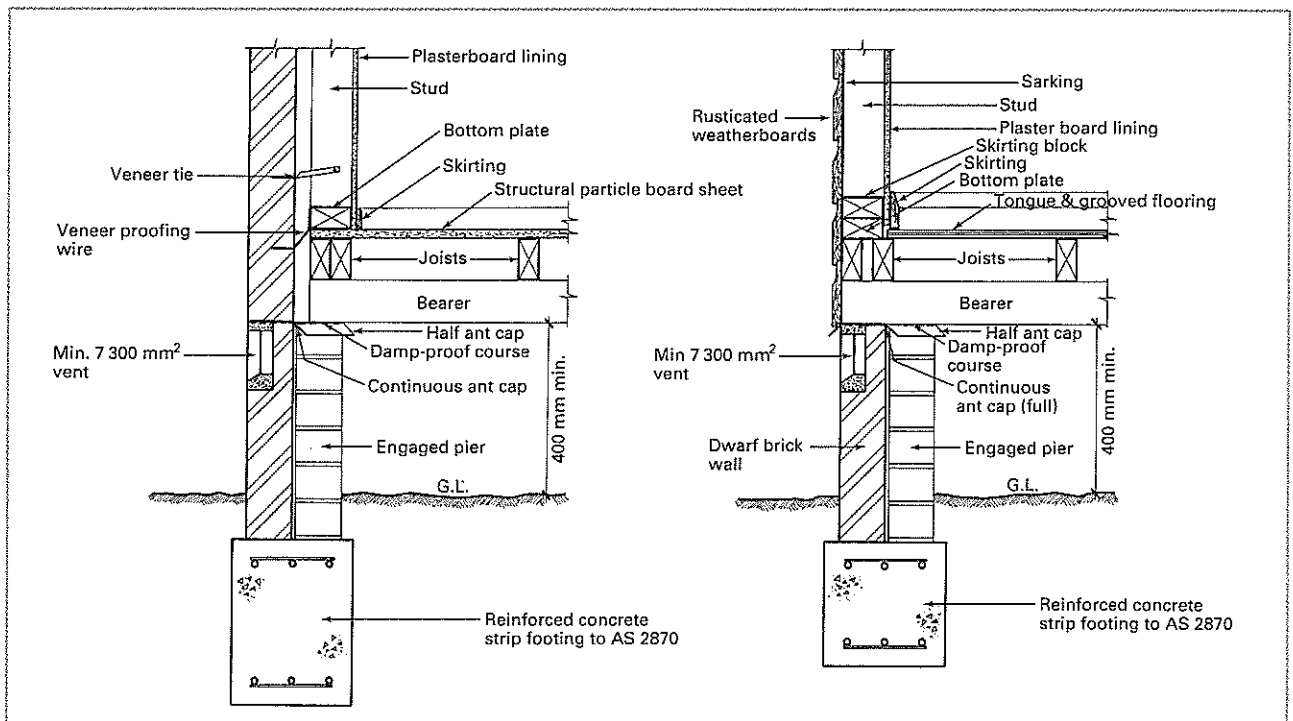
Vertical section through external walls of brick veneer and timber-frame construction
